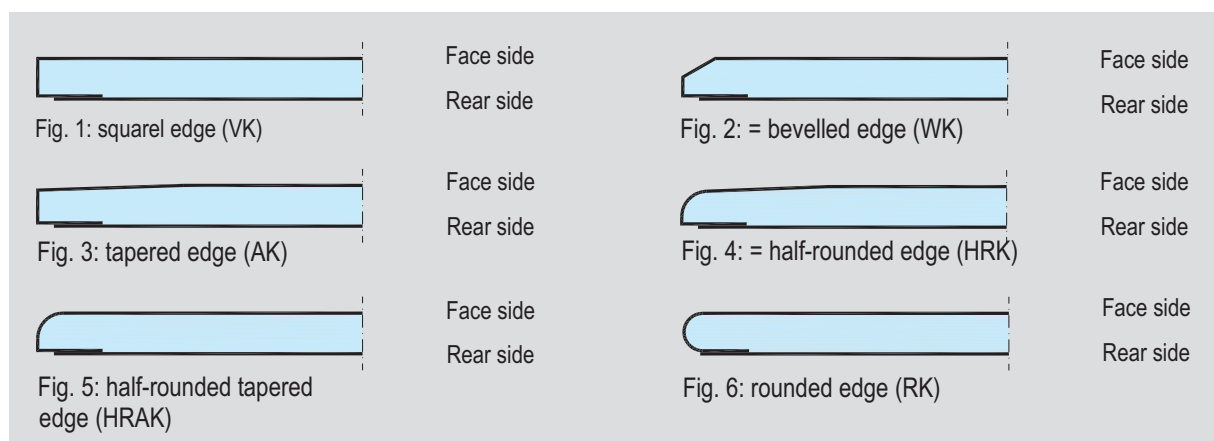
Long edge joints of gypsum boards (Extract from EN 520)
